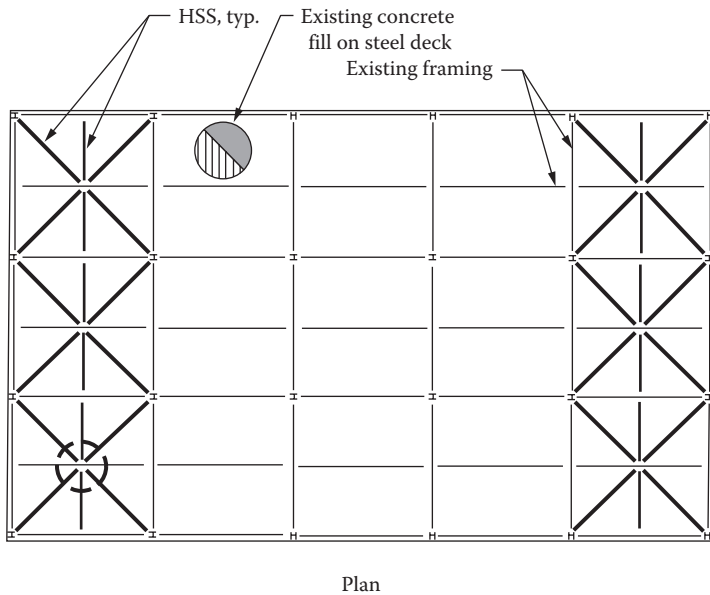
Diaphragm strengthening using horizontal braced frame.
